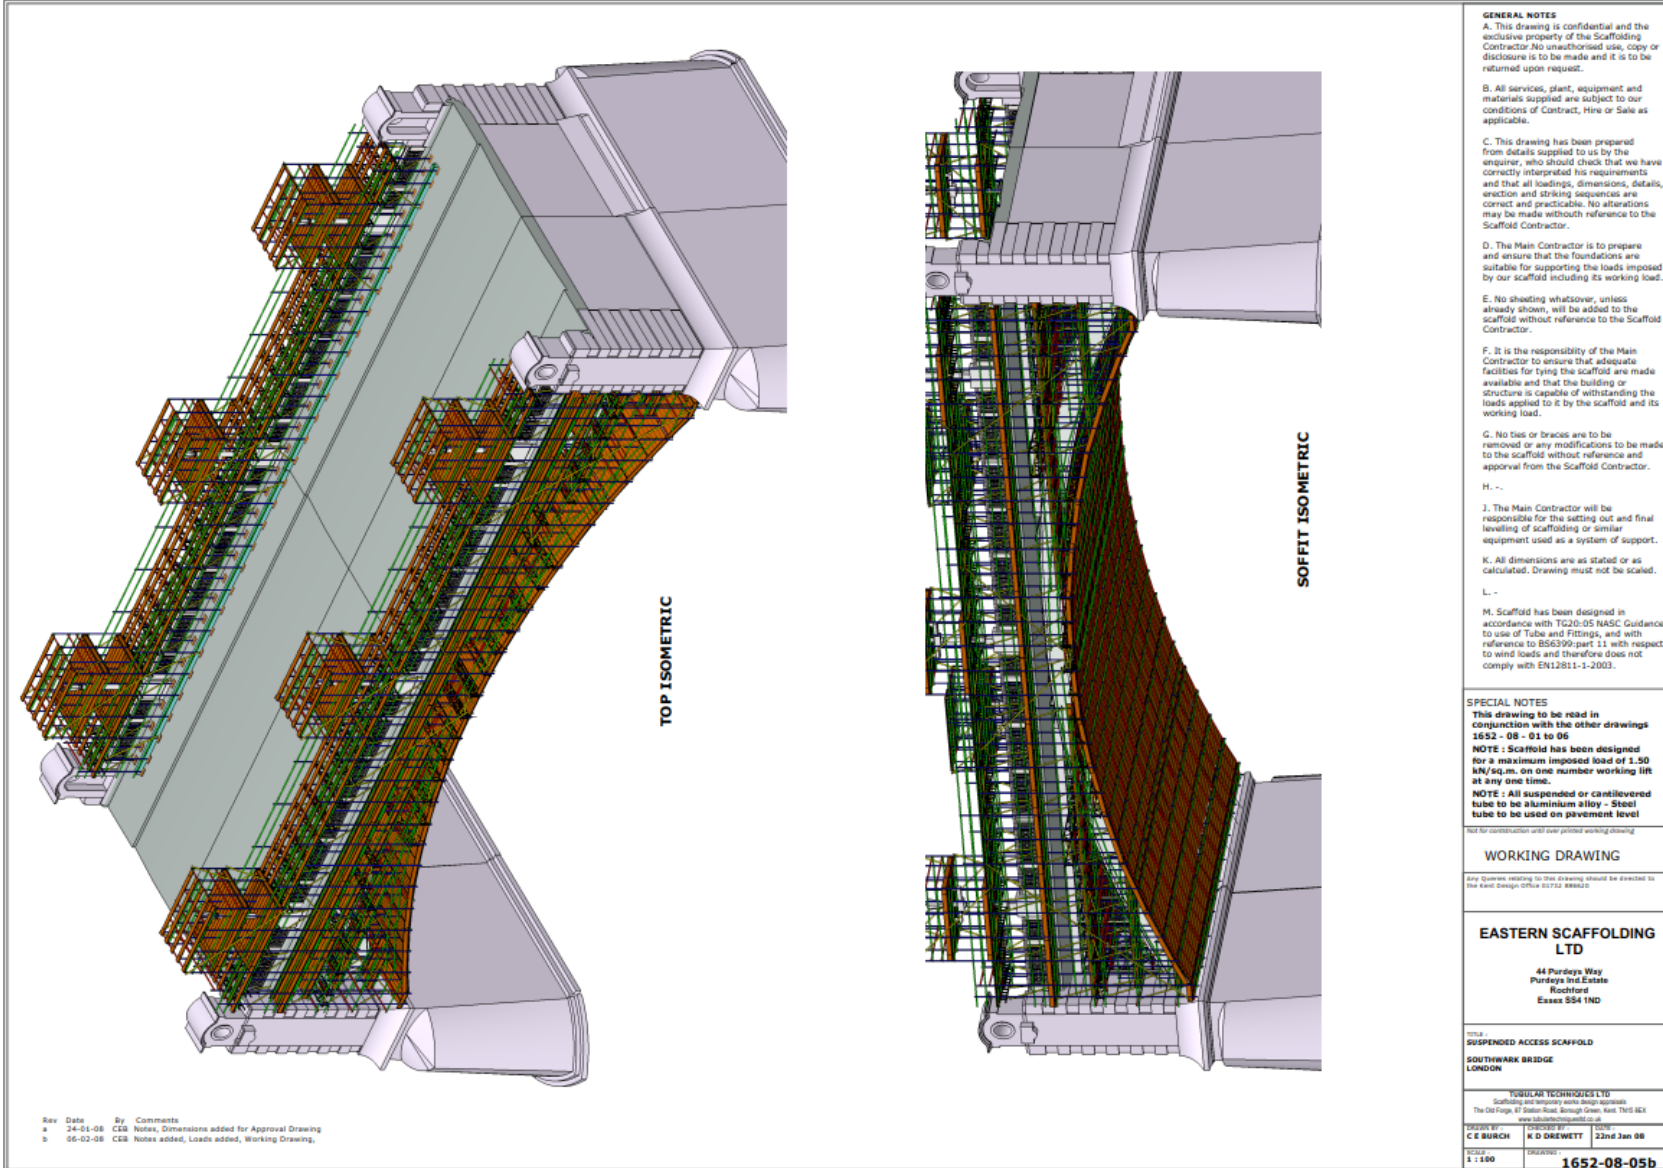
Scaffolding used on Southwark Bridge [5/6]
